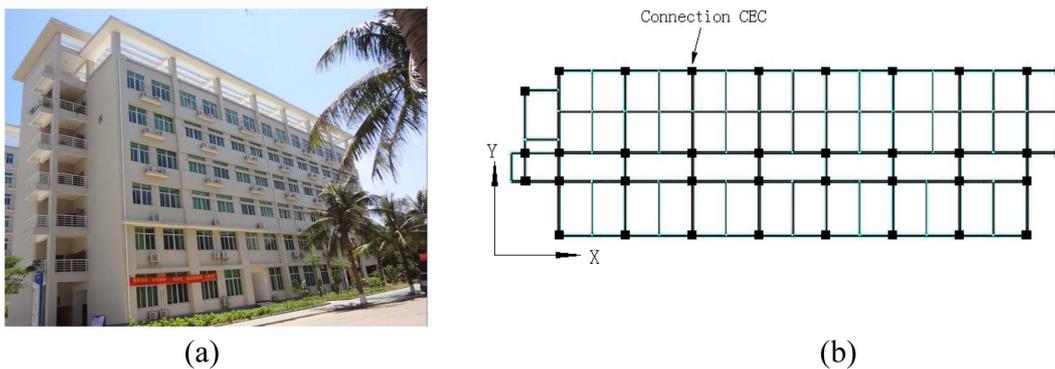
Prototype building and Connection CEC: (a) photograph, (b) second floor plan
